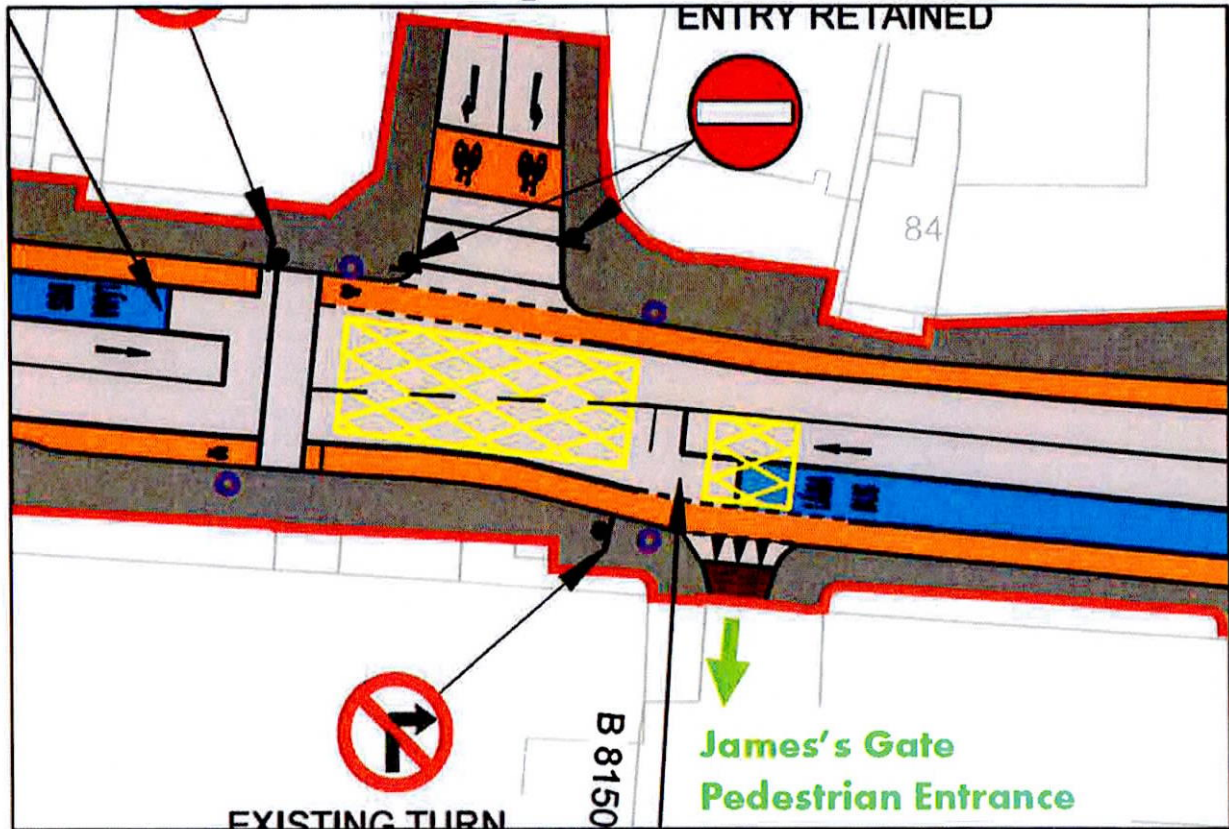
Detail of Proposed BusConnects James's Gate Layout (with added label for reference)
